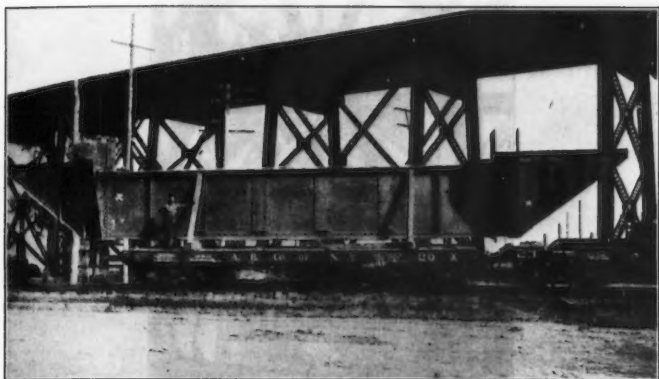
NEW FLOOR-BEAM AND TEMPORARY BRACKETS.
